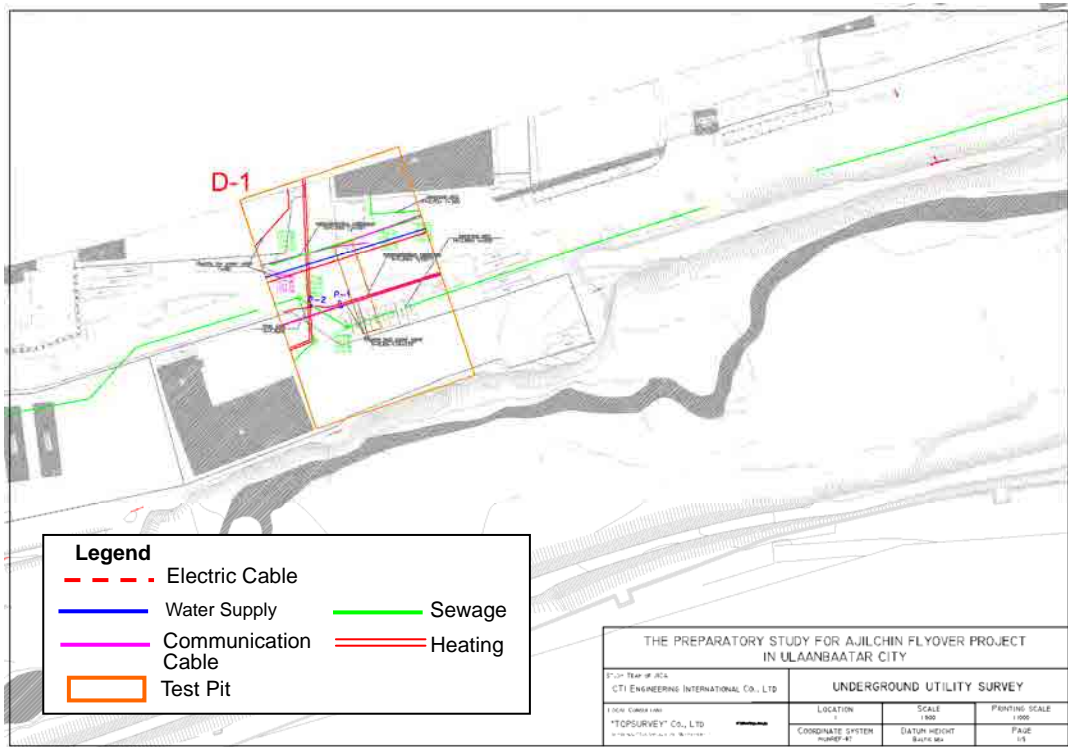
(1) Detailed Figure of Test Trench Location (D-1)
